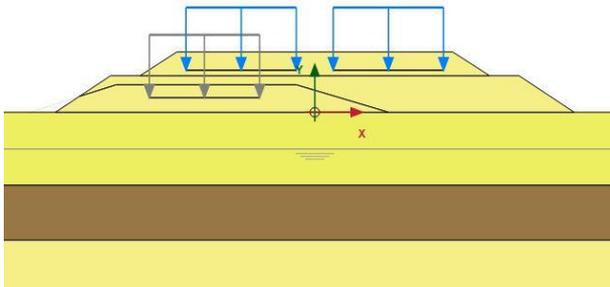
FEM model for A section without soil improvement: the last phase, new-build rail embankment with live loads.
